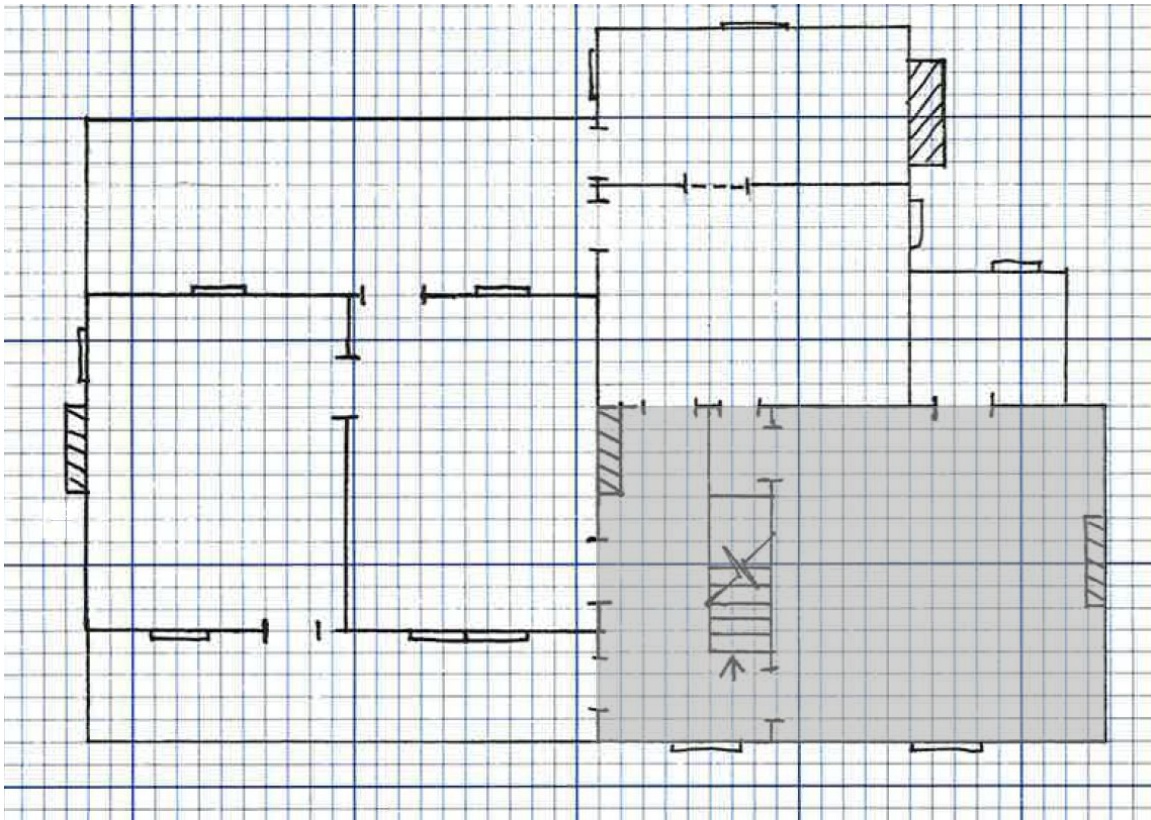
The McClung House plan, as drawn by McCleary in 1979. The gravel wall portion is shaded. Plan not to scale.
